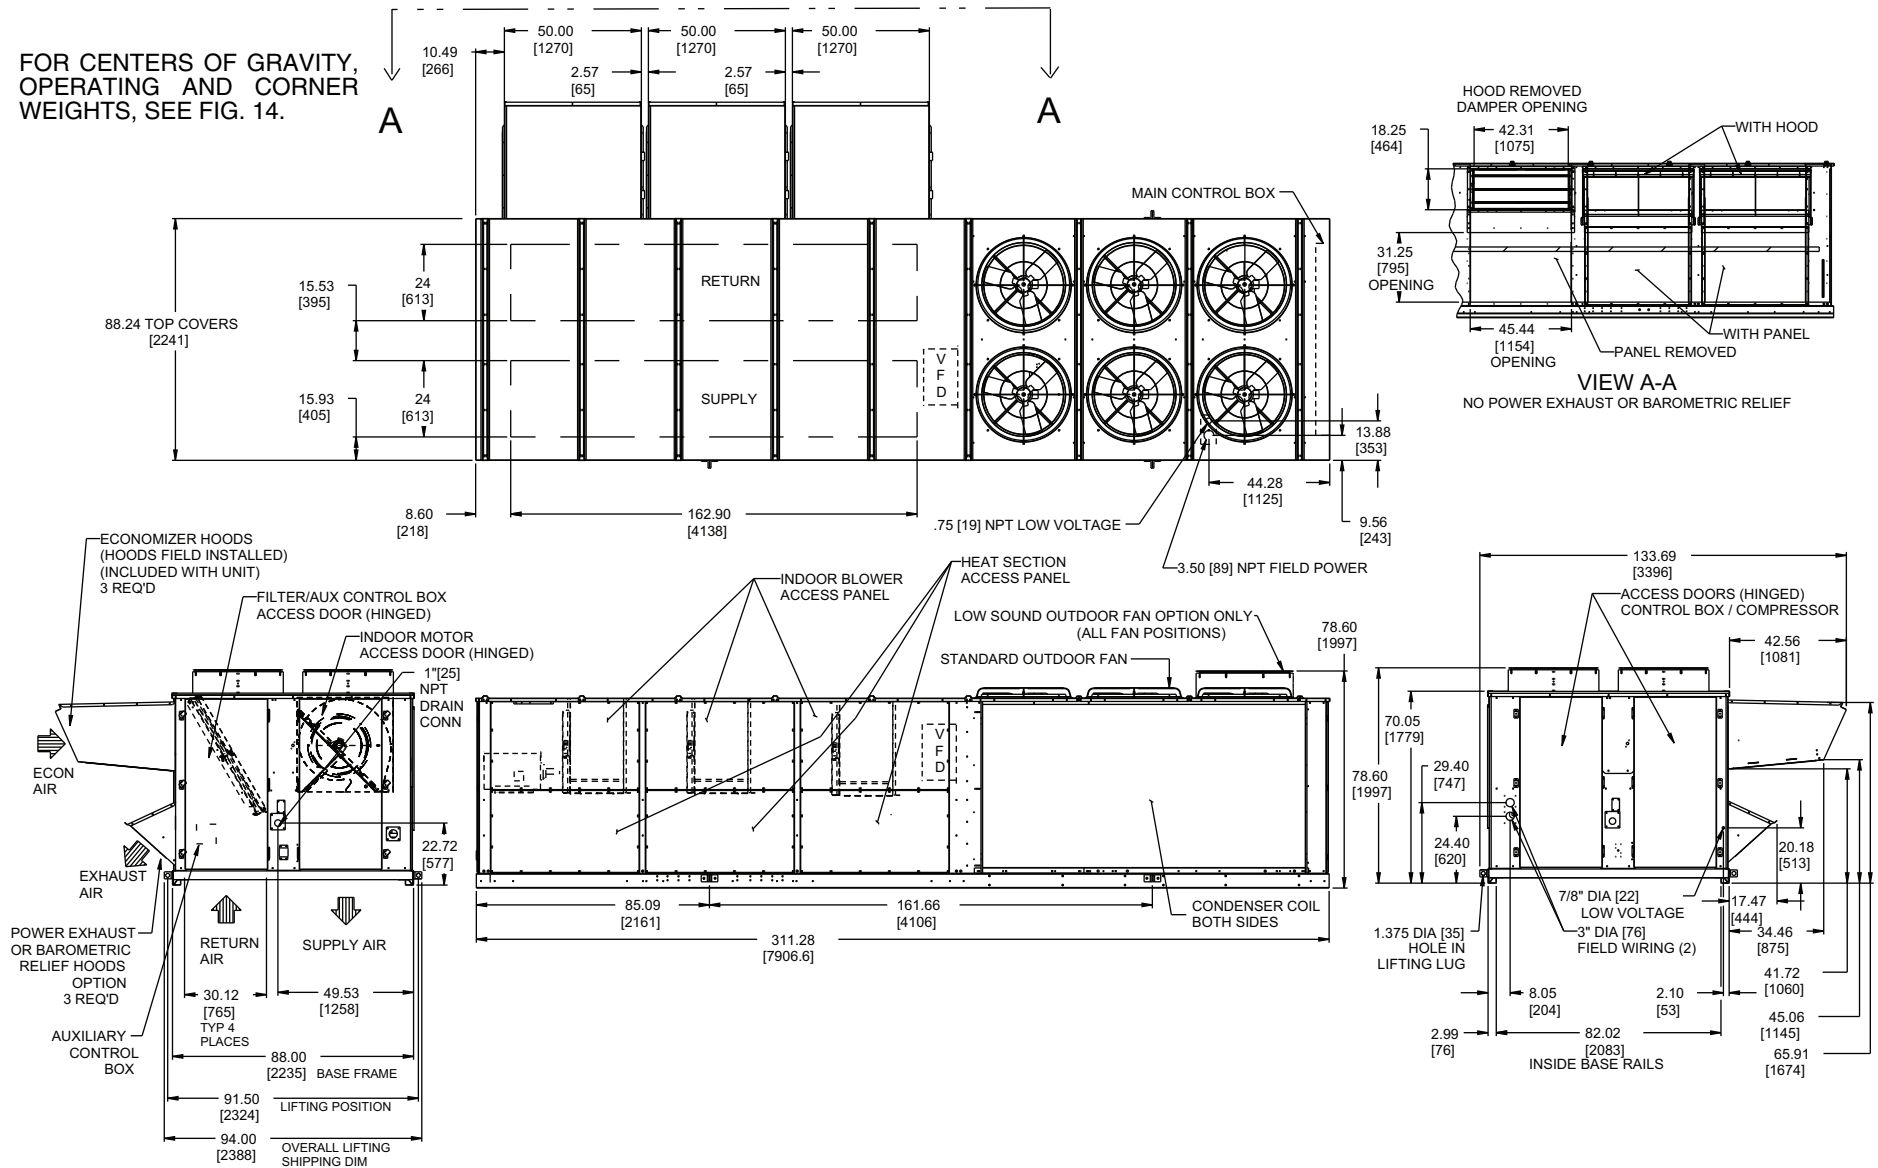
Base Unit Dimensions RTPF, CU Tube Condenser Bottom Supply and Return — 48A2,A3,A6,A7060
